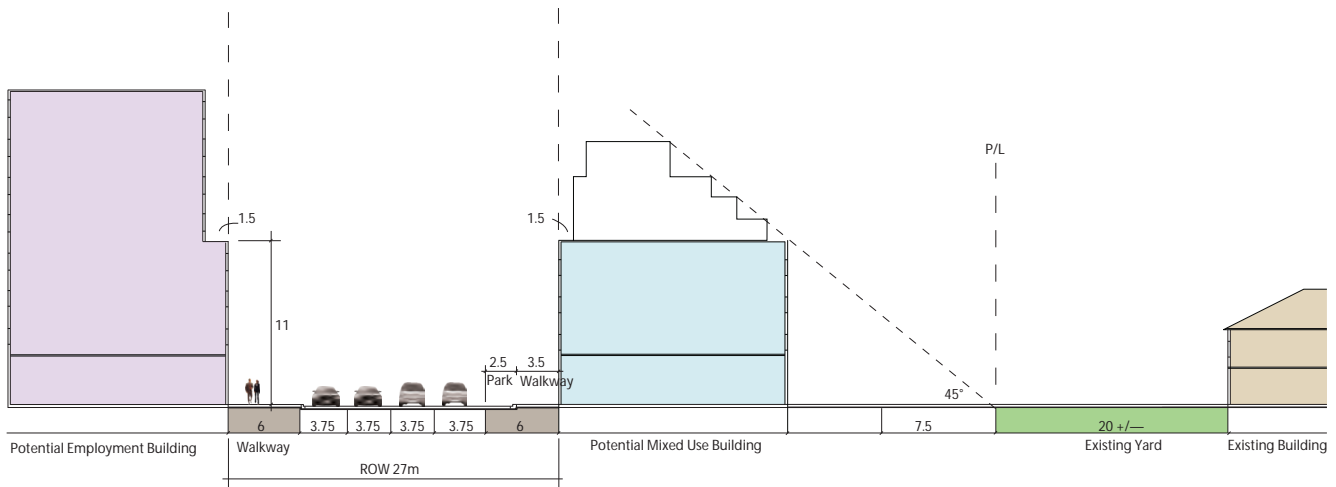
Cross section for Main Street Area - O'Connor Drive South
